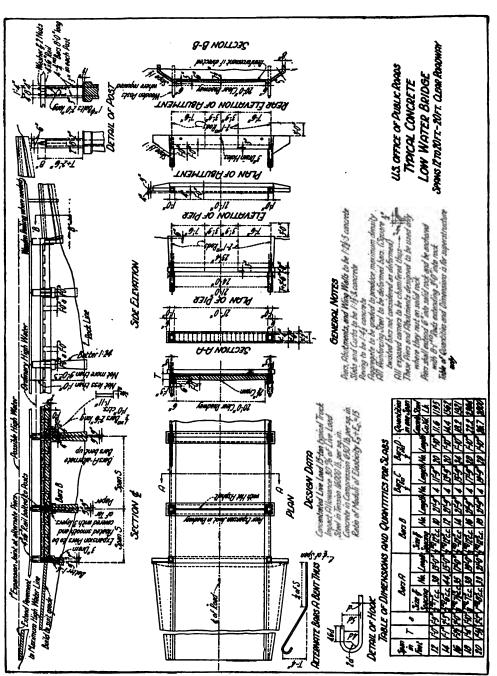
STANDARD CONCRETE DIP. U. S. BUREAU OF PUBLIC ROADS.
